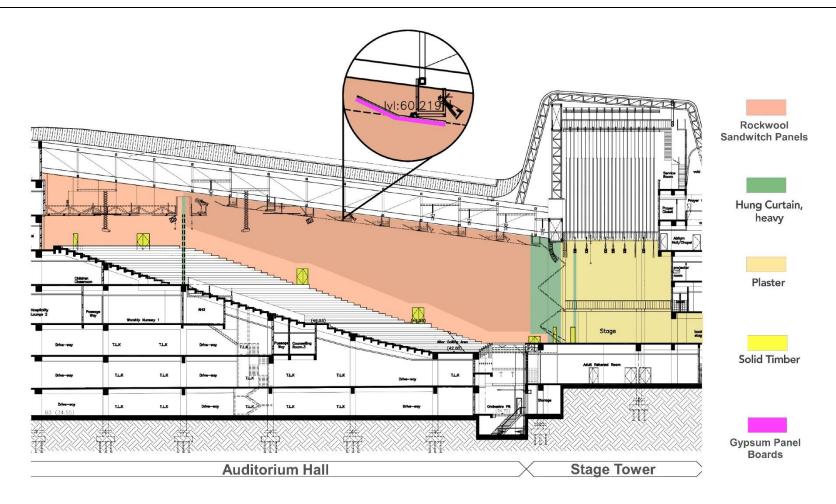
Calvary Church: Wall & ceiling surface finishes in section.
